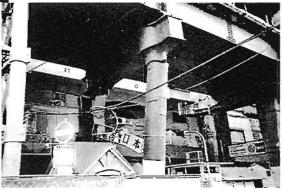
Ramp onto the Hanshin Expressway to the west of Kobe Another view of the tear in the steel wall of the column in Plates 6.55 and 6.56
